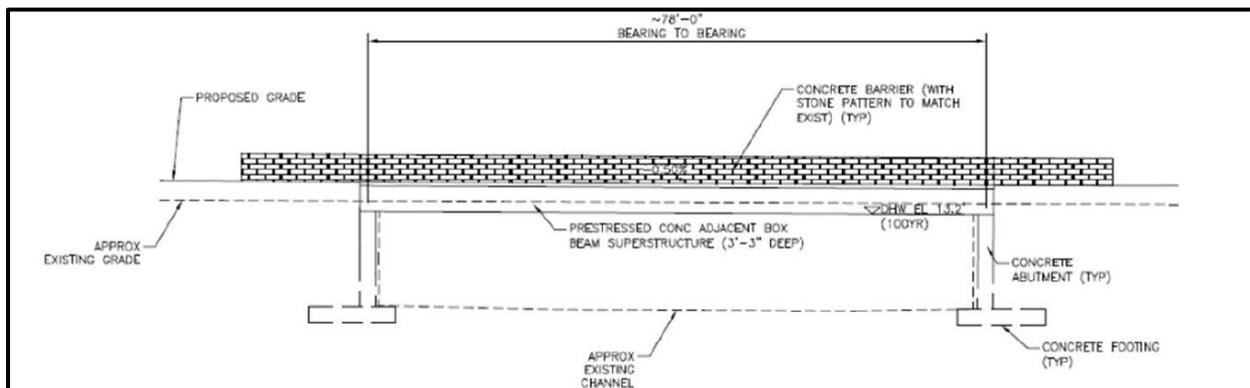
Concept Design of Replacement of the U.S. Route 1 Bridges
